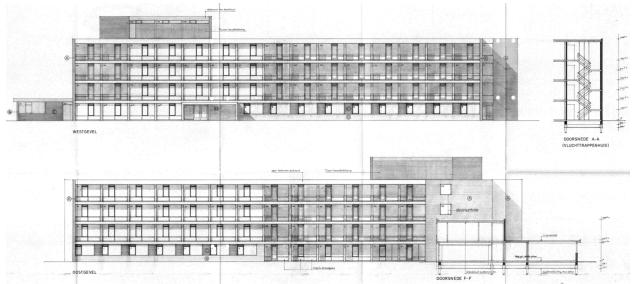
Façades and intersection of the Schuylenburcht complex [20]
